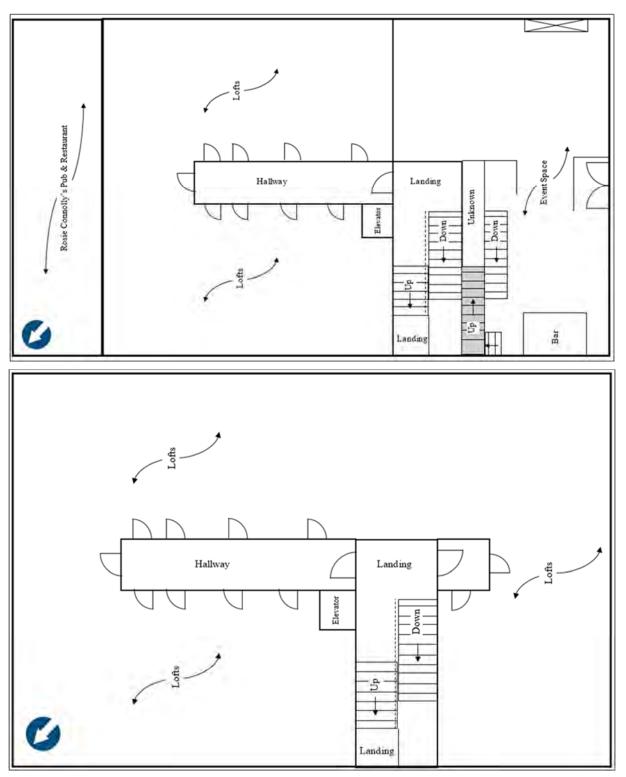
FIRST STORY FLOOR PLAN (TOP); SECOND AND THIRD STORY FLOOR PLAN (BOTTOM) (NOT TO SCALE)
